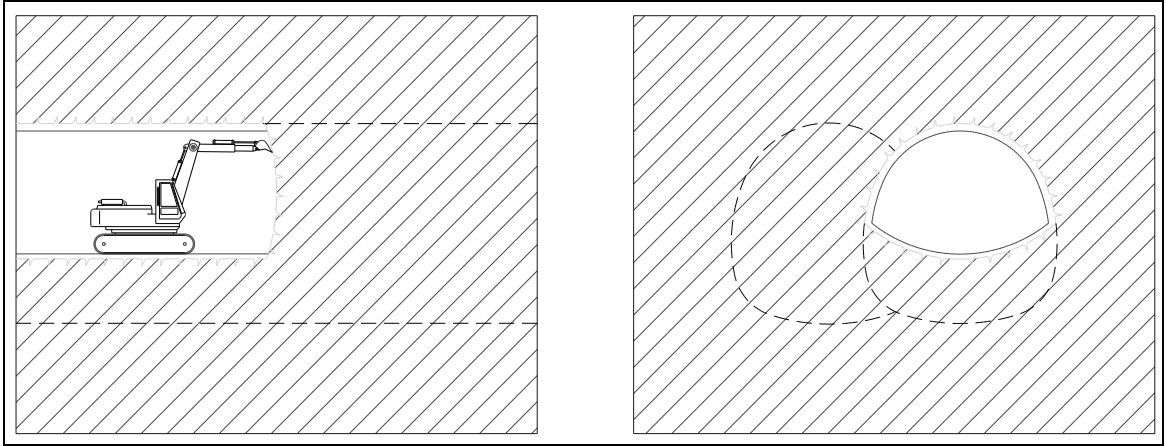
Stage 5 – Excavation OB Tunnel TH
